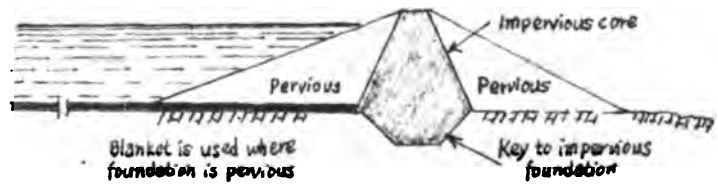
Embankment utilizing a central core and key of impermeable materials extending from above the water line to the foundation.
